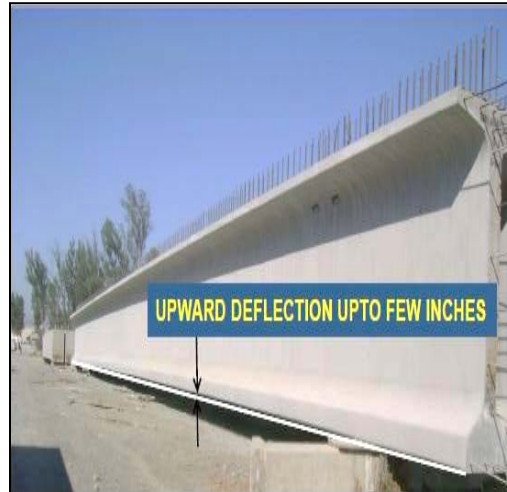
Measuring for Precast, Prestressed “I” Girder Camber.
